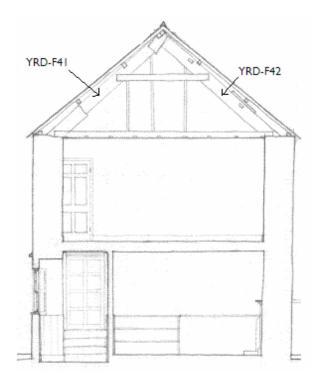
North-facing section through the North-South range, showing truss 6 and the location of samples YRD-F41 and YRD-F42 (Architecton, section position shown on Fig 16)
